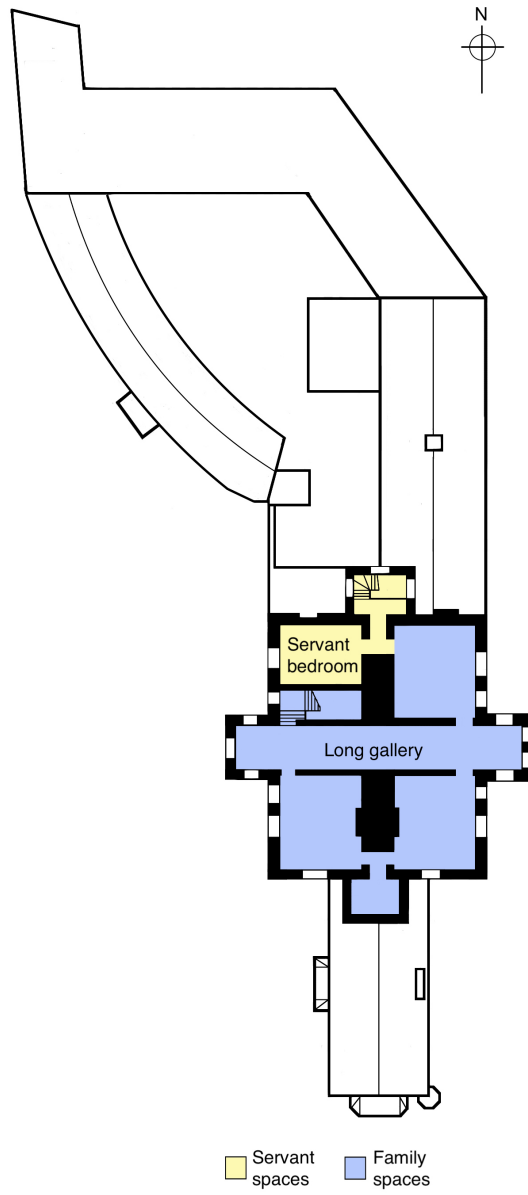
Kiplin Hall c1820 Phase 2 second floor plan
